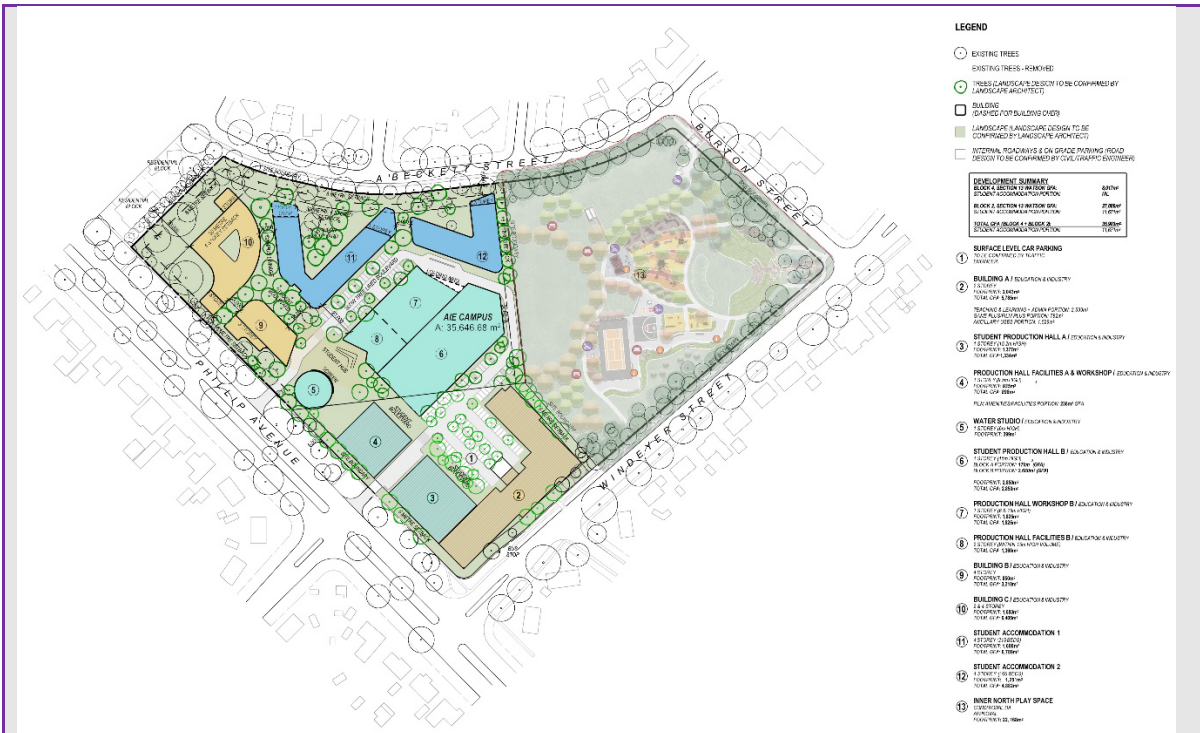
Figure E: AIE Campus Masterplan on completion (Extract from approved Revised Future Intentions Plan)
